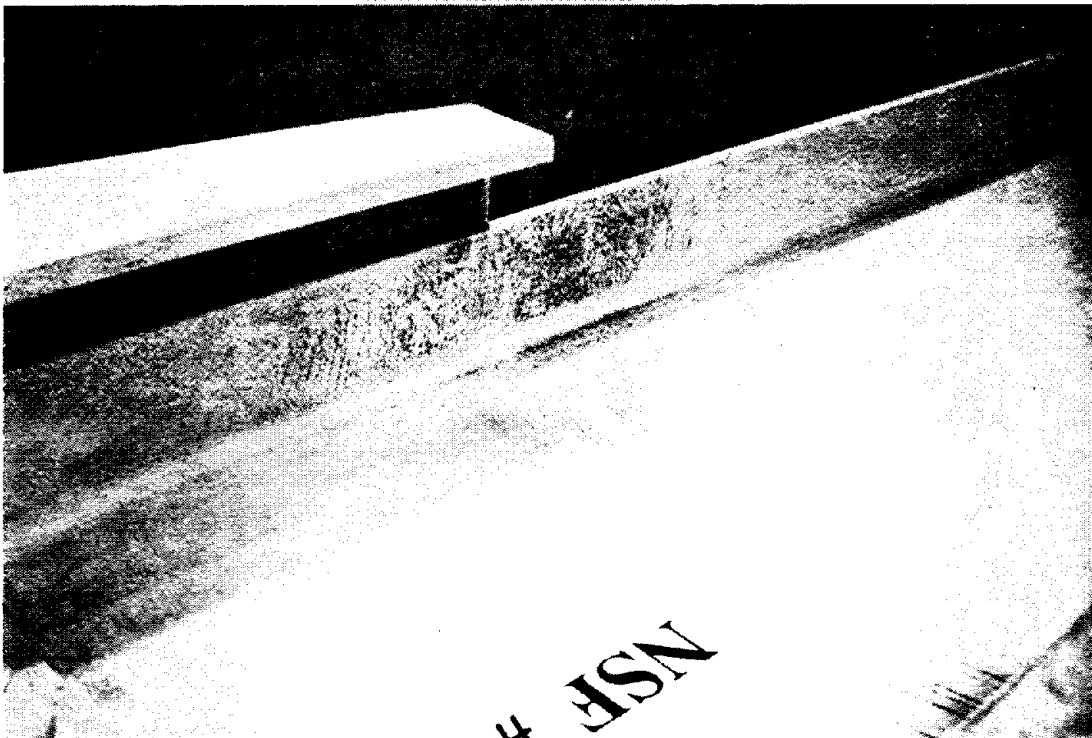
Yielding of Bottom Beam Flange and Web at 2-in. Displacement, Cycle 1
